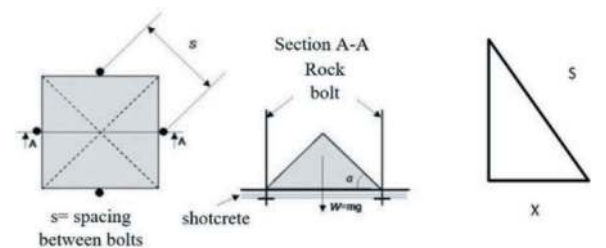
A rock wedge forms between rock anchors as part of the system anchorage, which helps disperse loading and reinforces shotcrete.
